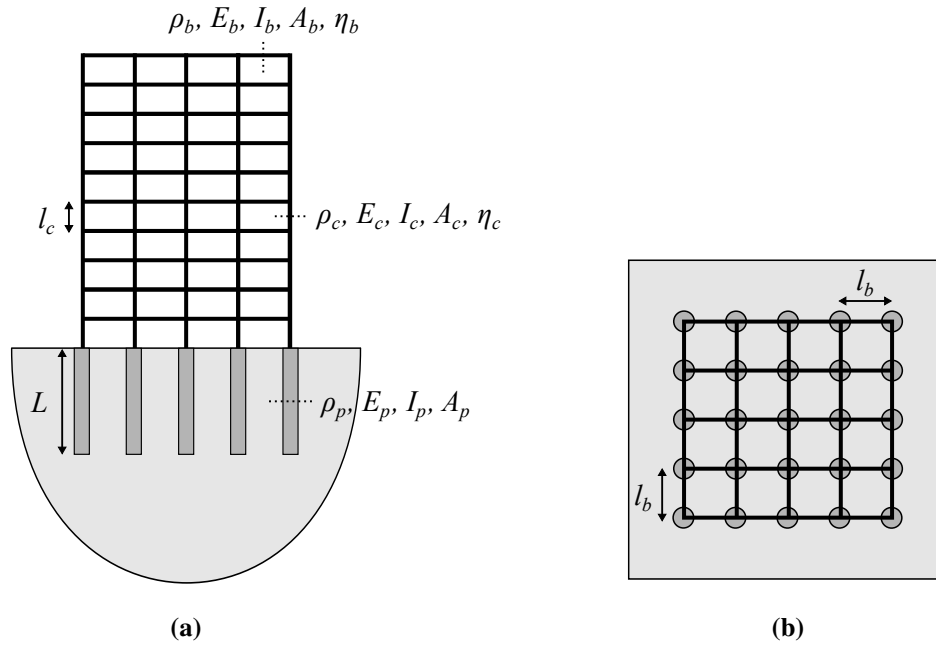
Schematic diagrams of the (a) side and (b) plan views of the pile-building system in the virtual case study. The residential building is represented by a 10-storey, 4-by-4-bay frame.
